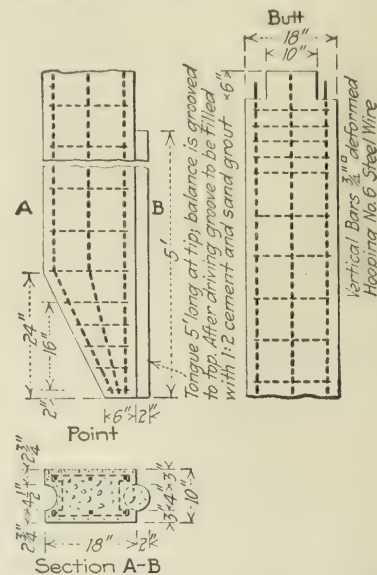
CONCRETE SHEETPILE USED IN SACRAMENTO WEIR
